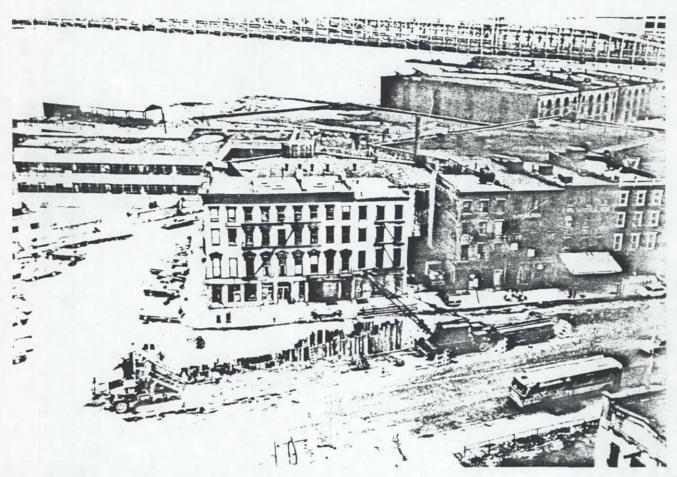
The Fulton Street sewer excavation. Looking north with the Brooklyn Bridge in the background.
